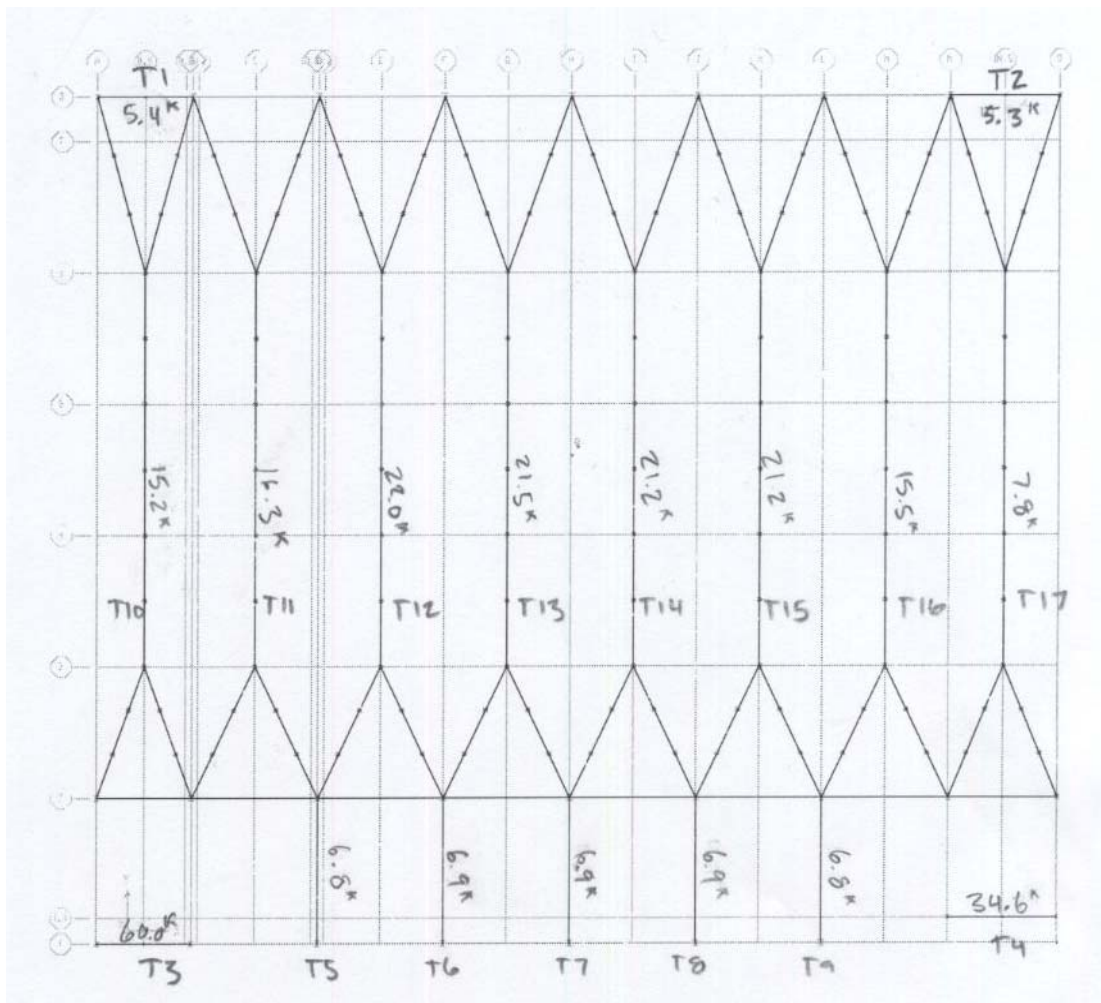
Plan of Roof Trusses and amount of shear taken by each
